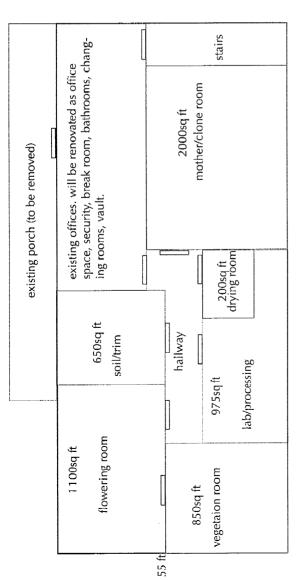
1 EXCHANGE STREET FLOOR PLAN AND PROPOSED BUILD-OUT (PHASE 1)
